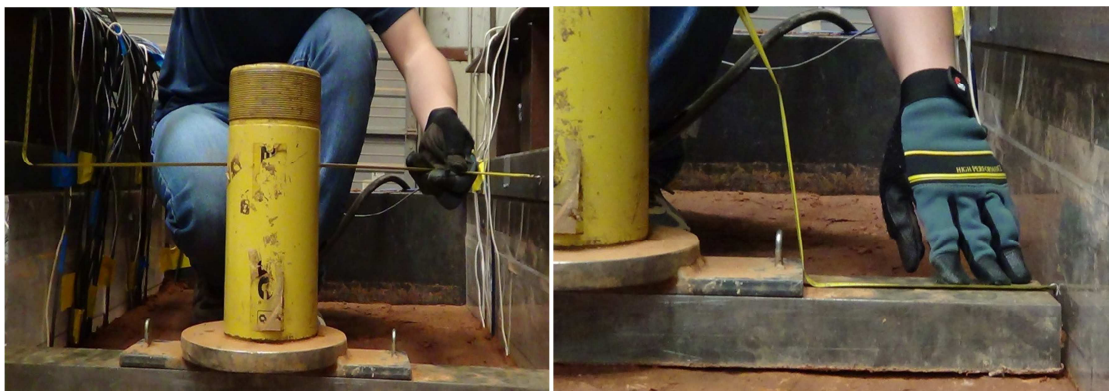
Placing the hydraulic cylinder at the center of footing and reaction beam in embankment tests
